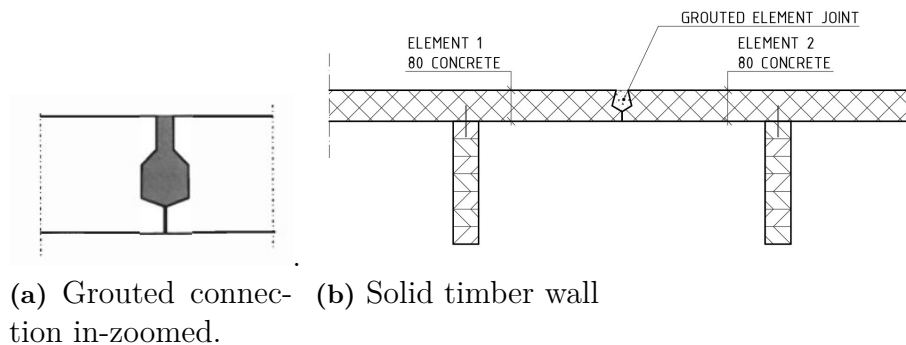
Grouted connection between two adjacent concrete slabs.
